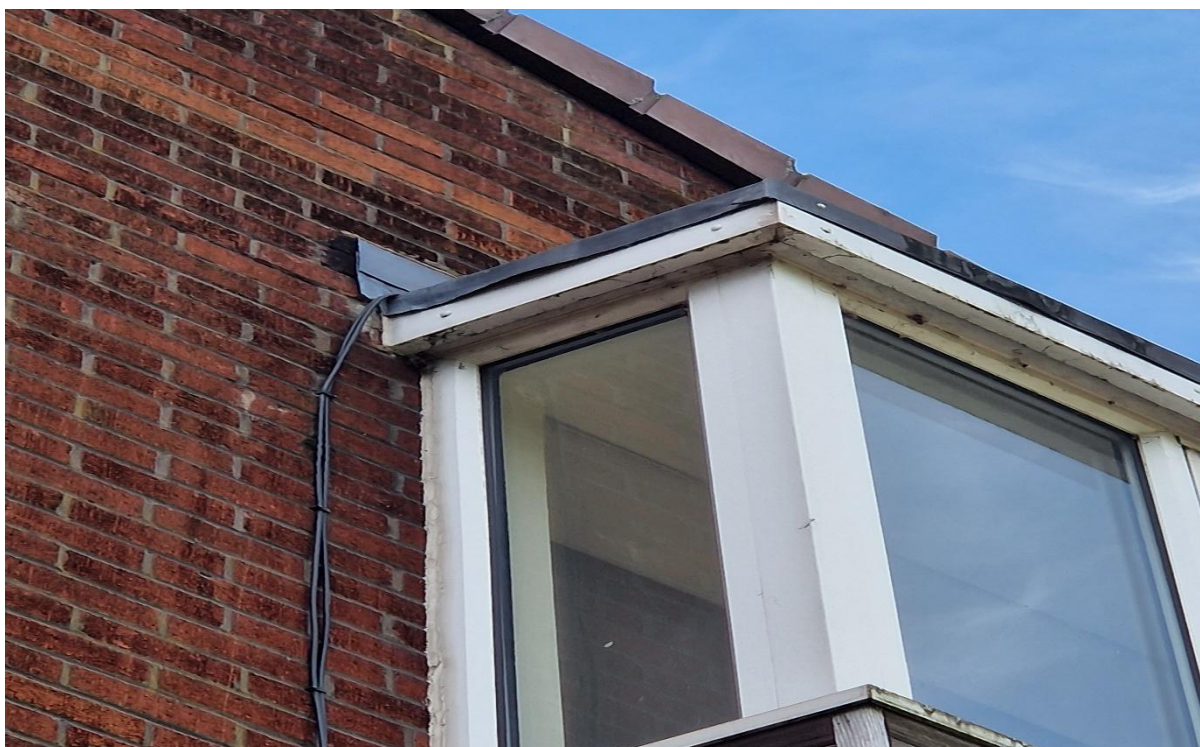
Image showing the lifted flashing on the southern elevation of B1.
